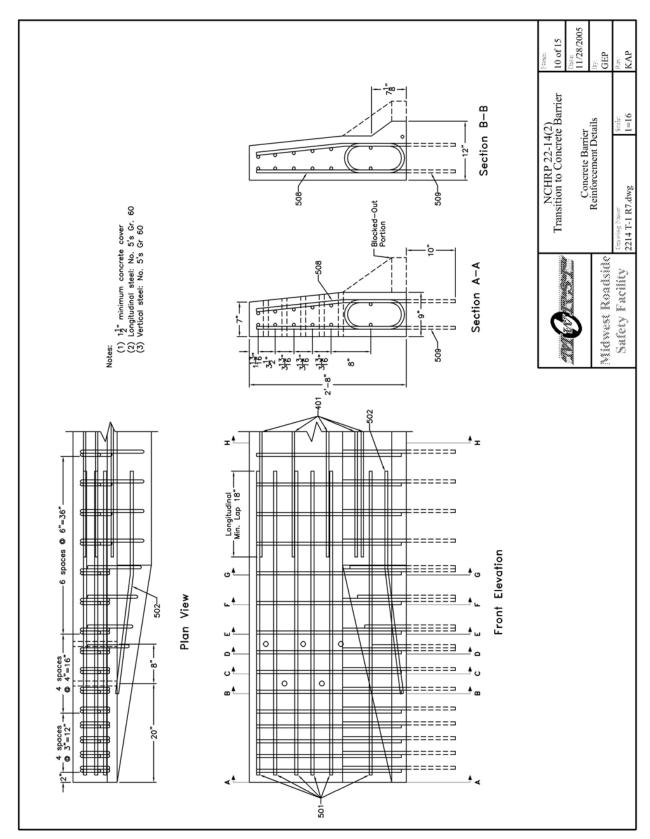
Approach Guardrail Transition to Concrete Barrier Design - Reinforcement Details (English)
